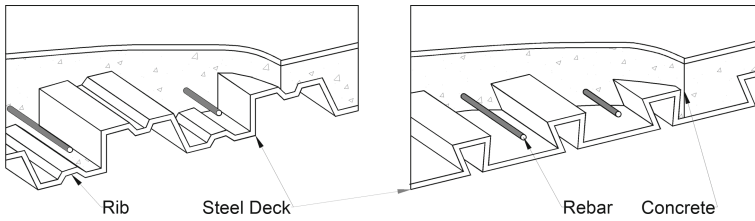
Composite slab with trapezoidal (left) and re-entrant (right) steel deck.
